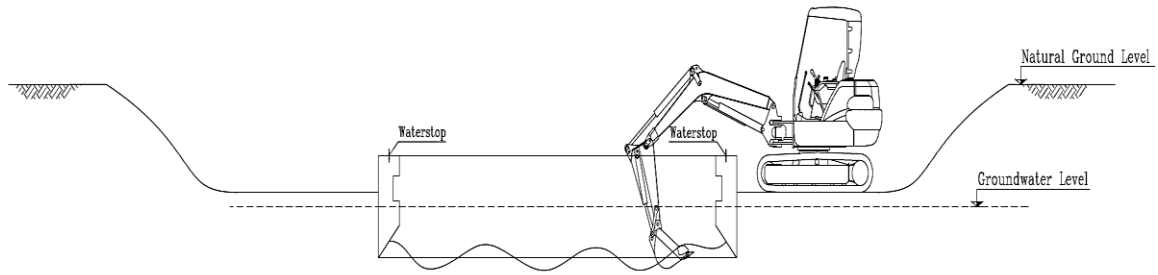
Construction of the first part of the wall with wedge-shaped section
